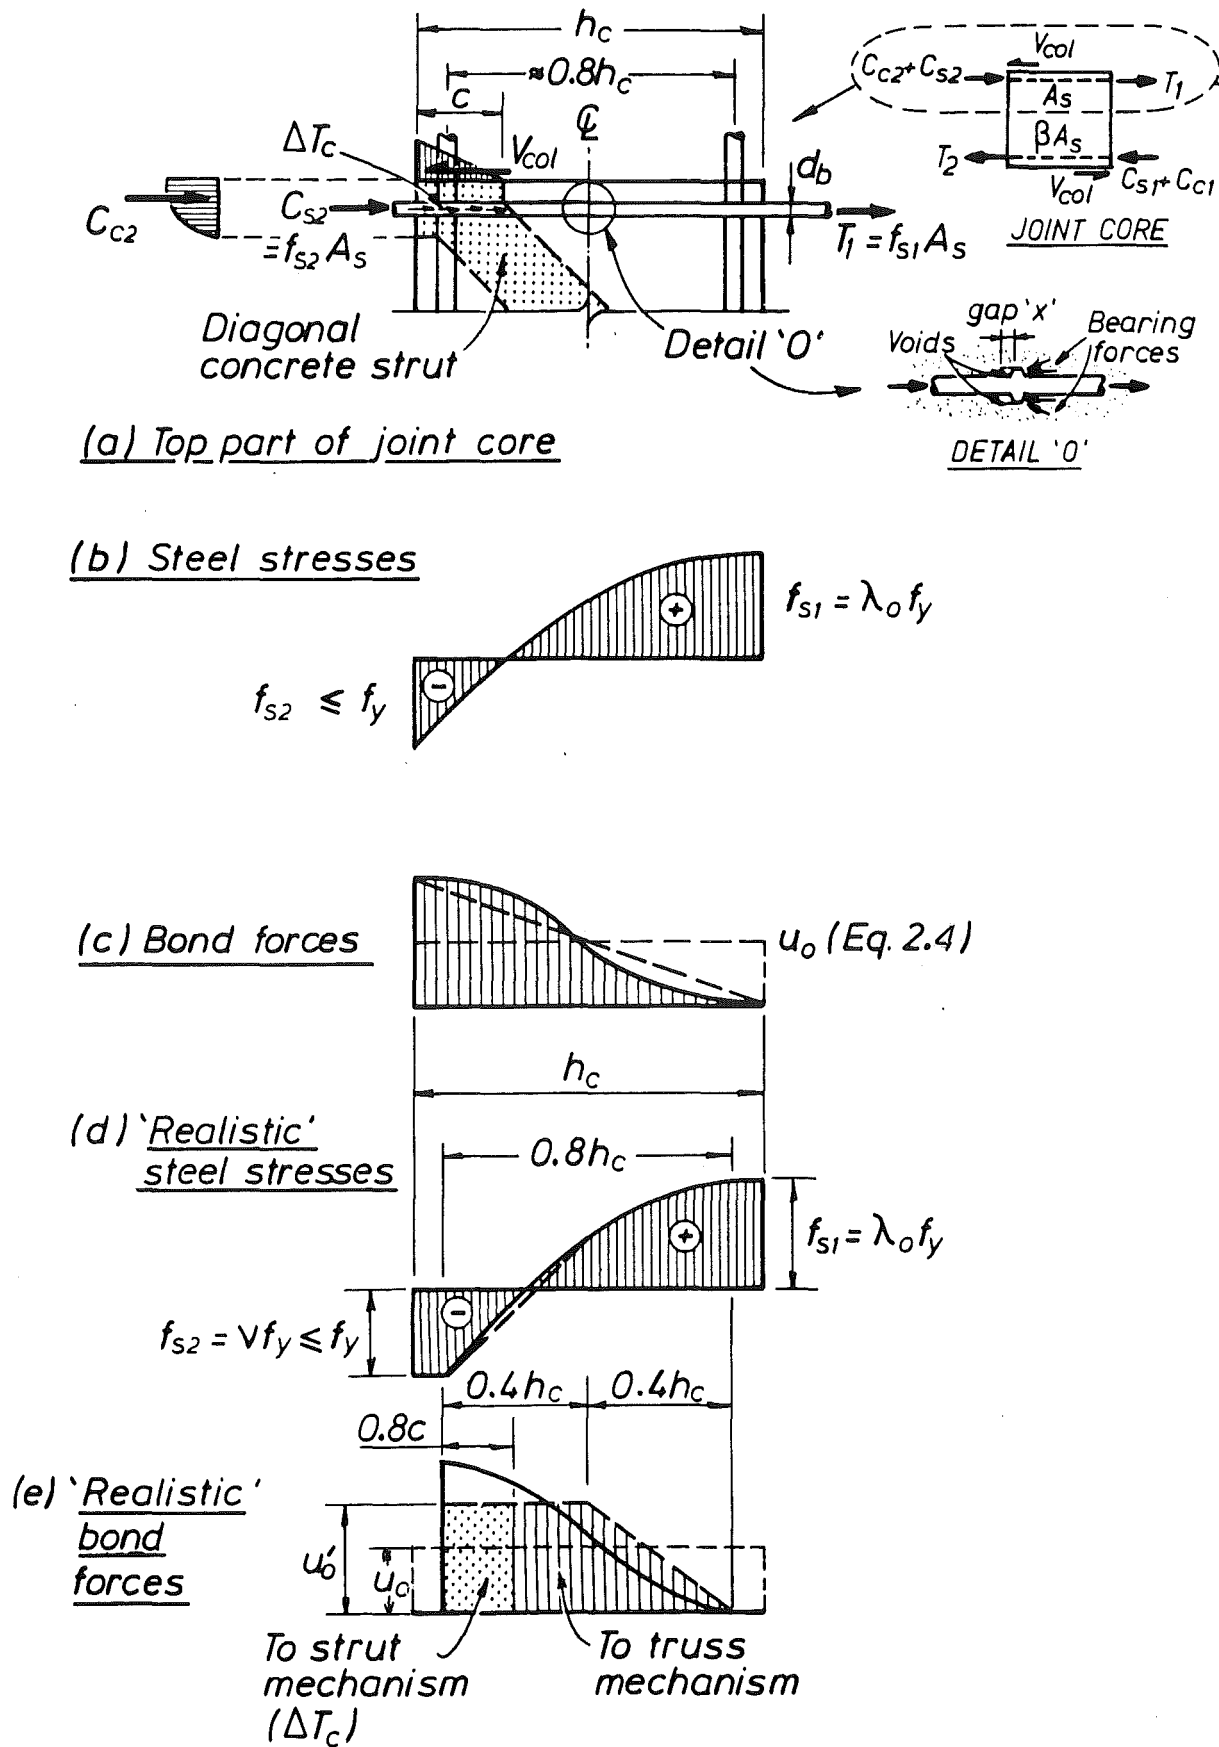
Assumed actions in an inelastic interior joint with imperfect anchorage of beam bars
